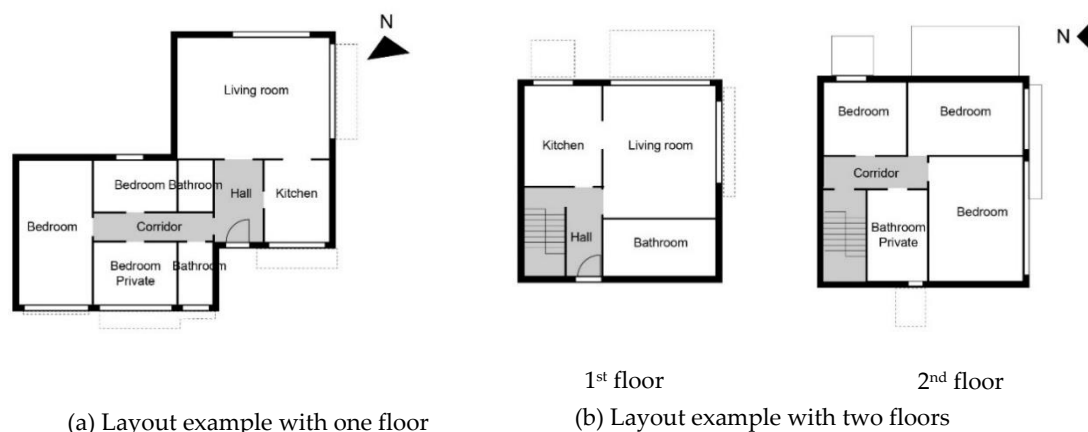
Examples of two layout sets in [69] (left: layout with one floor, right: layout with two floors). The interior partitions divide the layout into different thermal zones.
